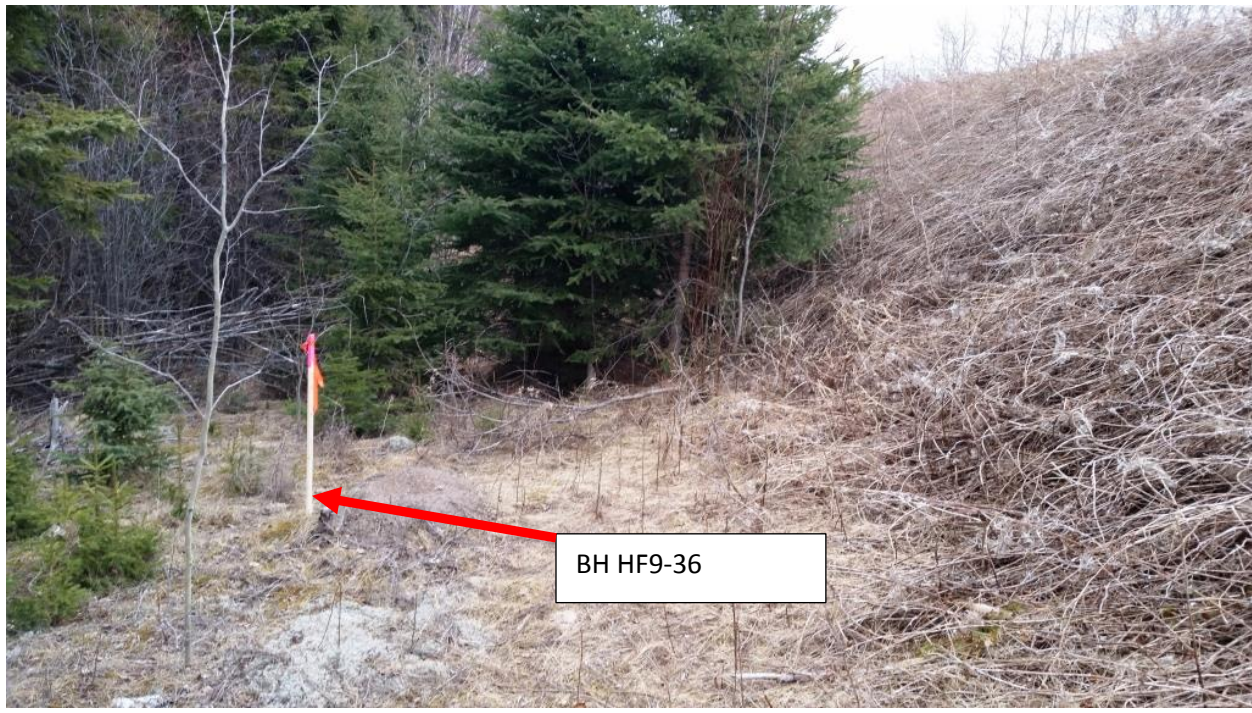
Looking toward east – BH HF9-36 (April 2017)
